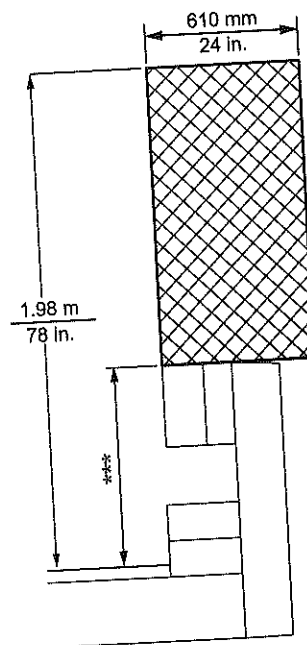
Zone of Intrusion for TL-3 Concrete Barriers and Steel Tubular Rails on Curbs
